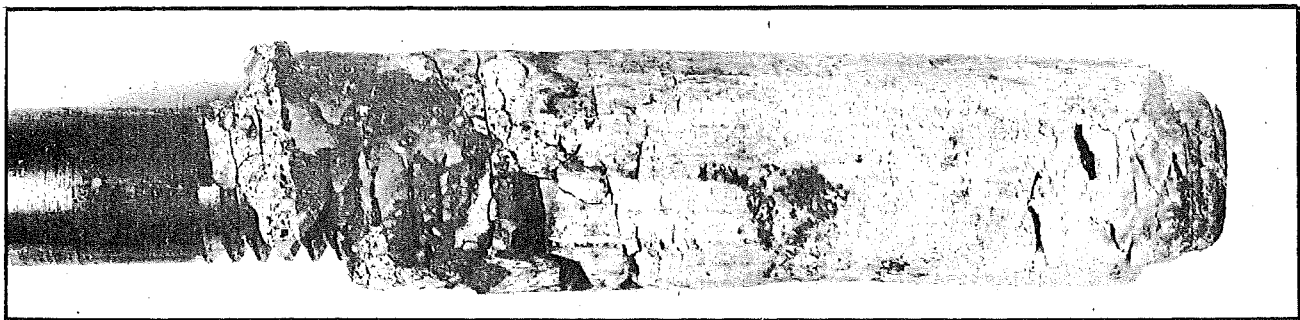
Appearance of threaded rod and grout with 2-1/2 in. embedment, after the following treatment: a) impact hammer dropping 4 ft caused fracture of high-strength rod, b) rod was then rethreaded and given two more blows with 1-ft hammer fall causing some damage to concrete and grout, and c) rod was then pulled from block with universal testing machine, requiring a load of 6250 lb, and this split the block.
